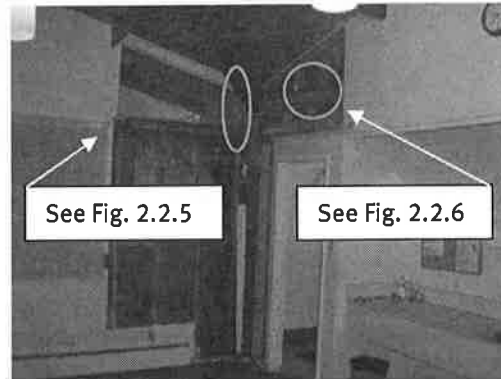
View of Interior Exploratory Opening Below Northwest Corner of Sloped Roof
